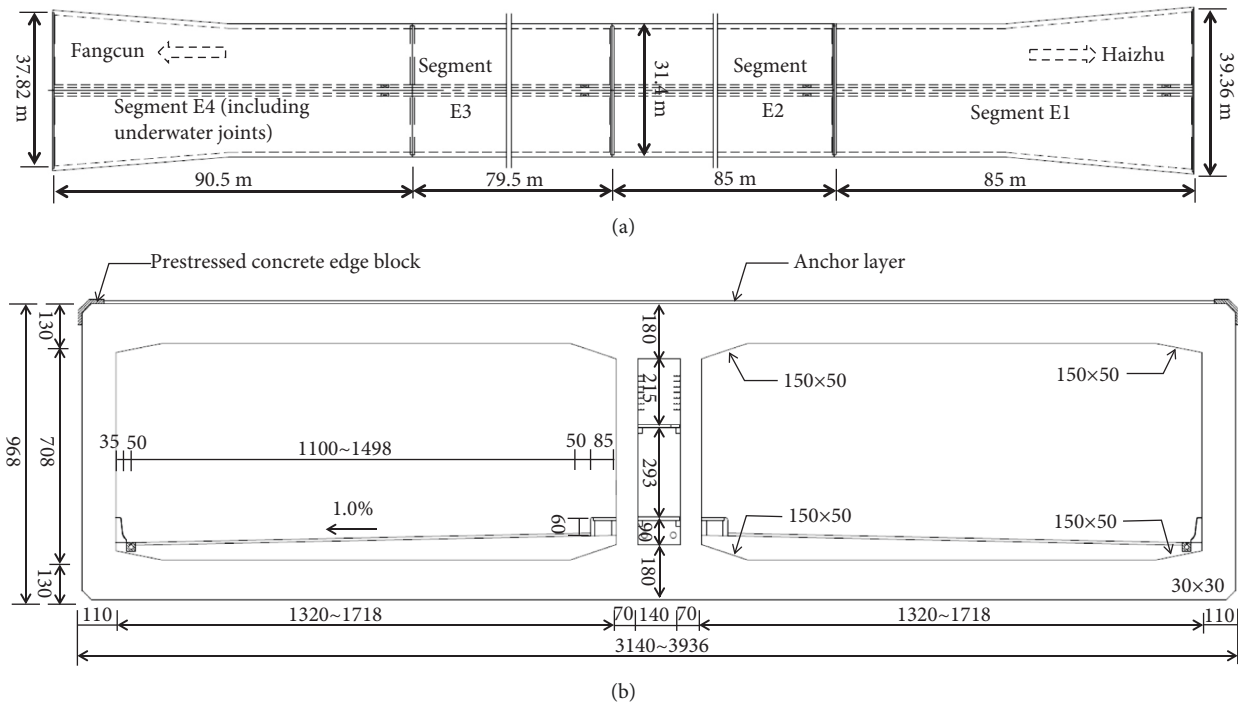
The overall design of the Zhoutouzui tunnel: (a) the tunnel plan; (b) the segment cross section, including the joints.
